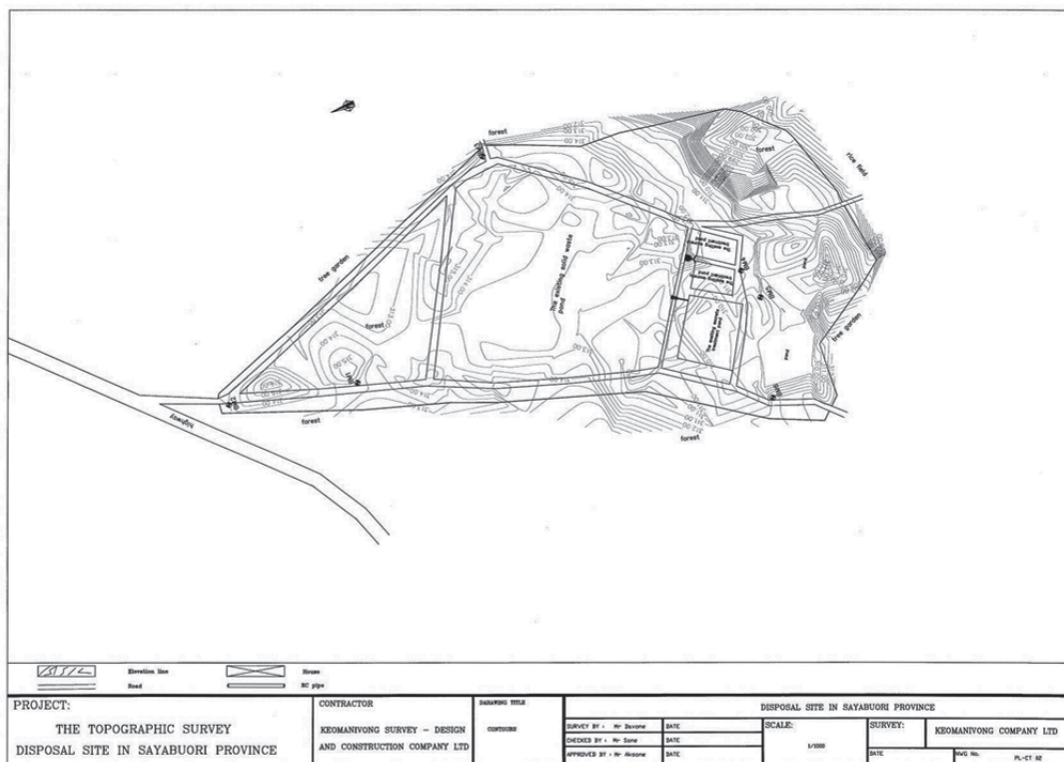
The boundary of pilot area at KM9 existing final disposal site
